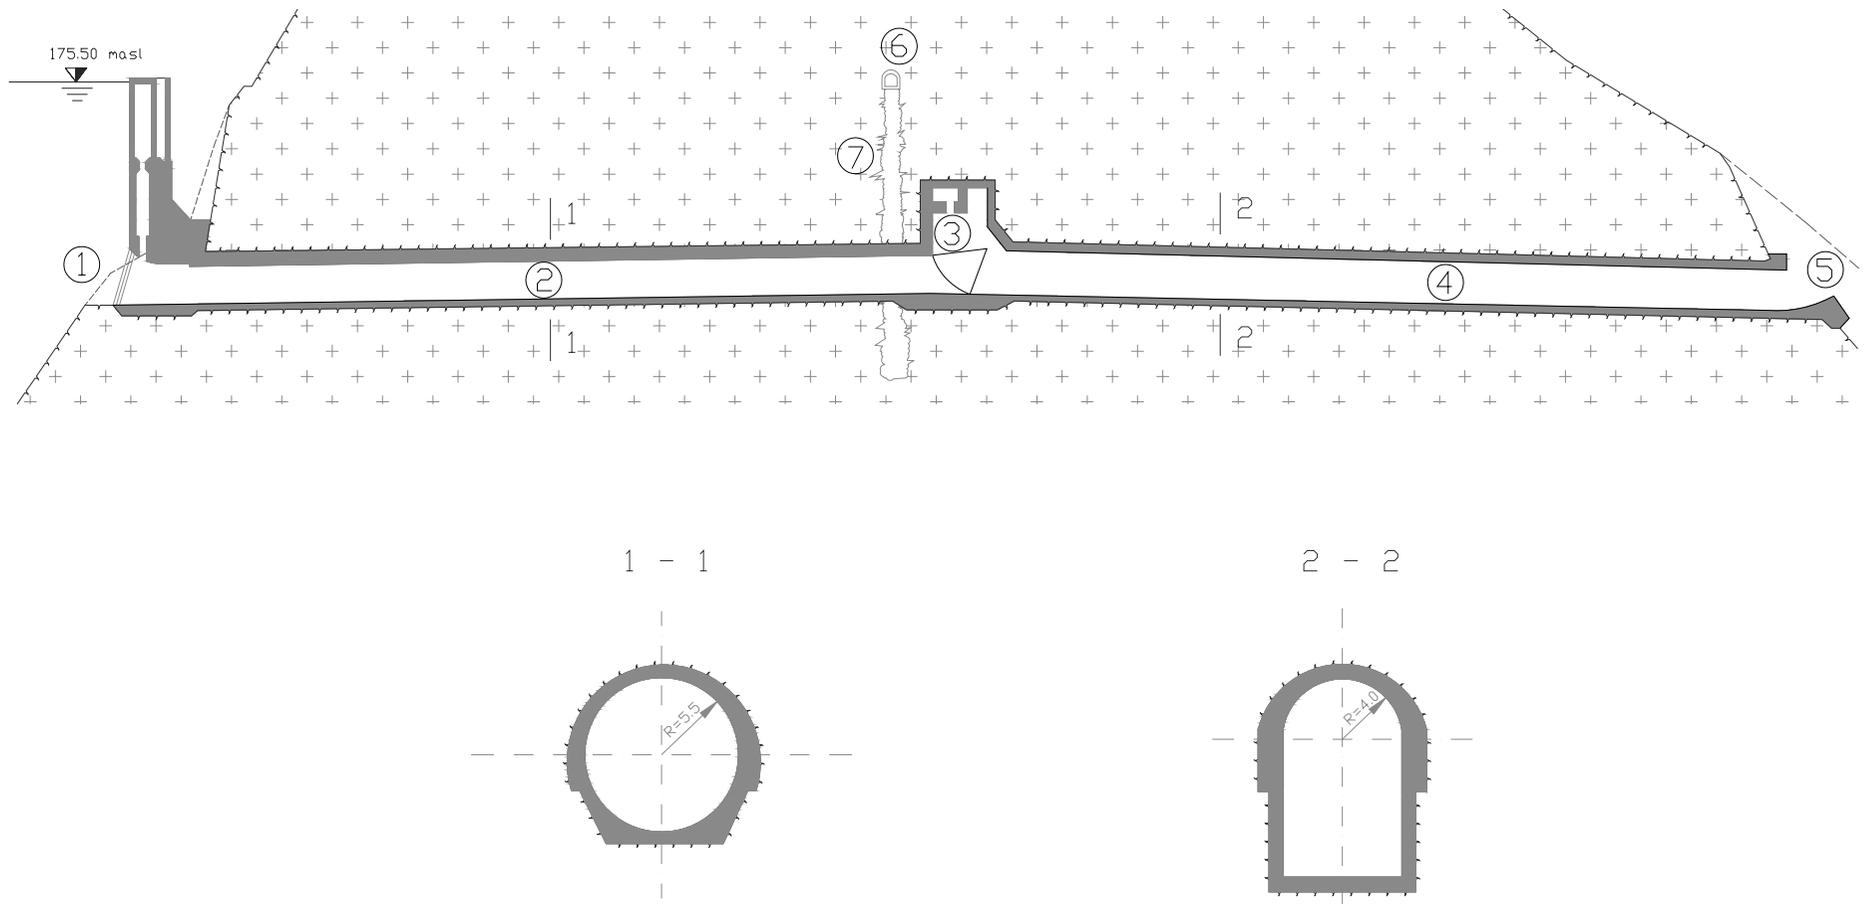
Longitudinal profile of spillway tunnel No. 3. ①: spillway intake, ②: pressure tunnel, ③: spillway gate, ④: free flow tunnel, ⑤: flip bucket, ⑥: access gallery, ⑦: grout curtain.
